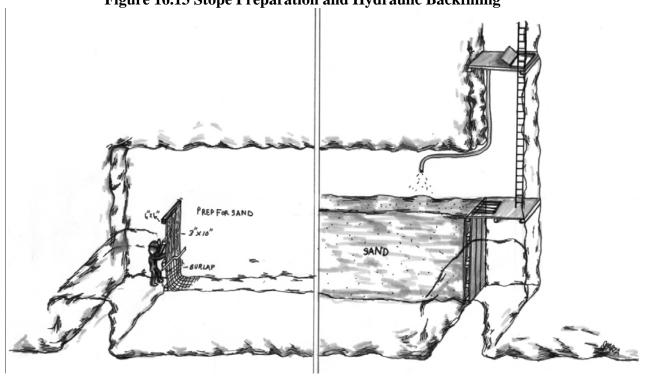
Stope Preparation and Hydraulic Backfilling
